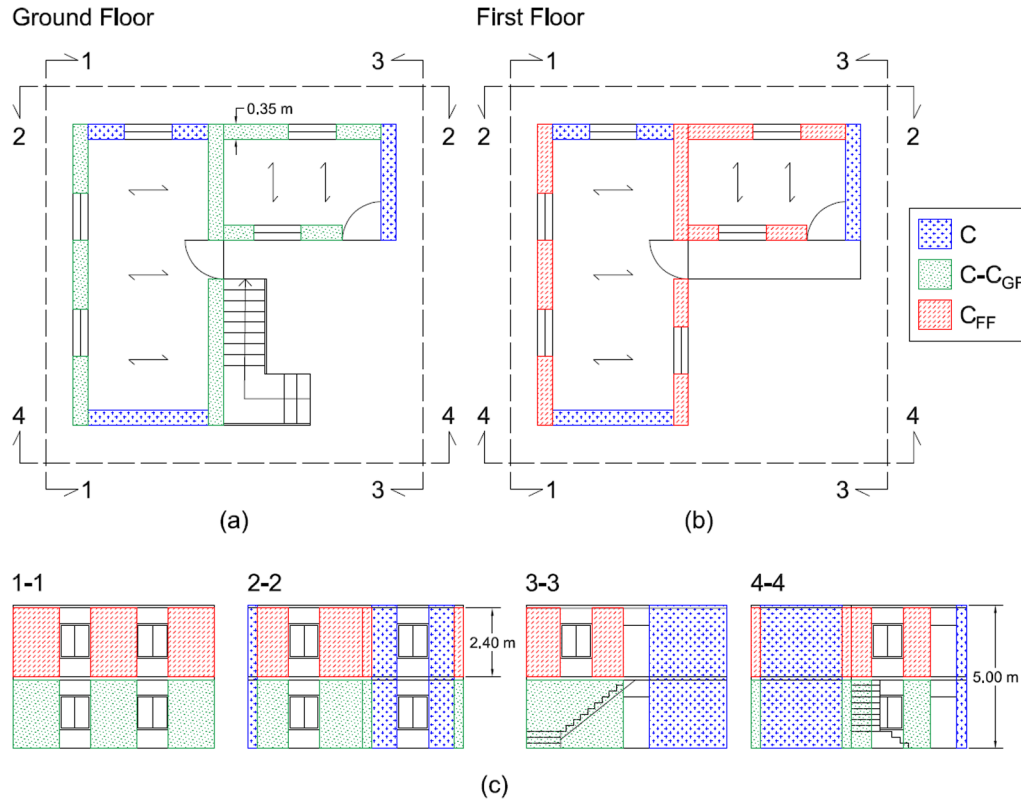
Case-study URM Nepalese school building: (a) plan view of the ground floor; (b) plan view of the first floor; (c) elevation views.
